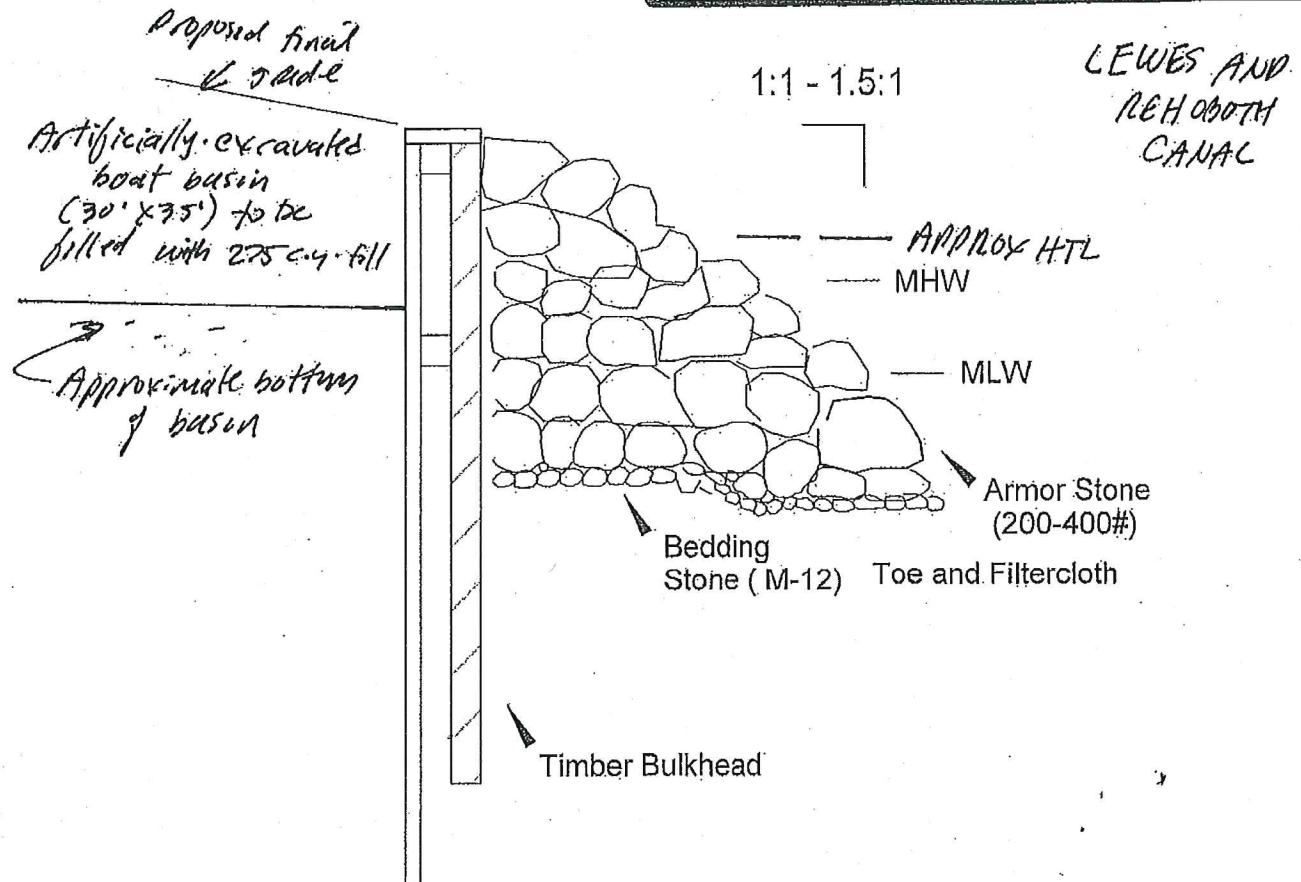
Cross-section of proposed timber bulkhead and rip-rap, to be placed at artificially-excavated boat basin (prepared by Precision Marine Construction, Inc.).
